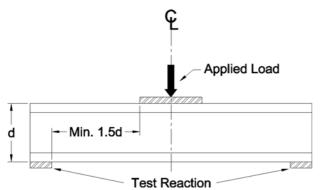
End Reaction Test Set-up (symmetric set-up allows for one end-bearing test per specimen)
